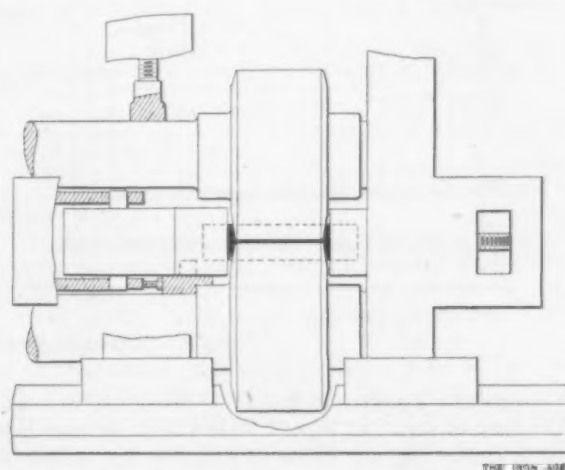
Elevation of the York Universal Mill, Showing the Method of Rolling an 18-In. Beam with 6-In. Flanges.
